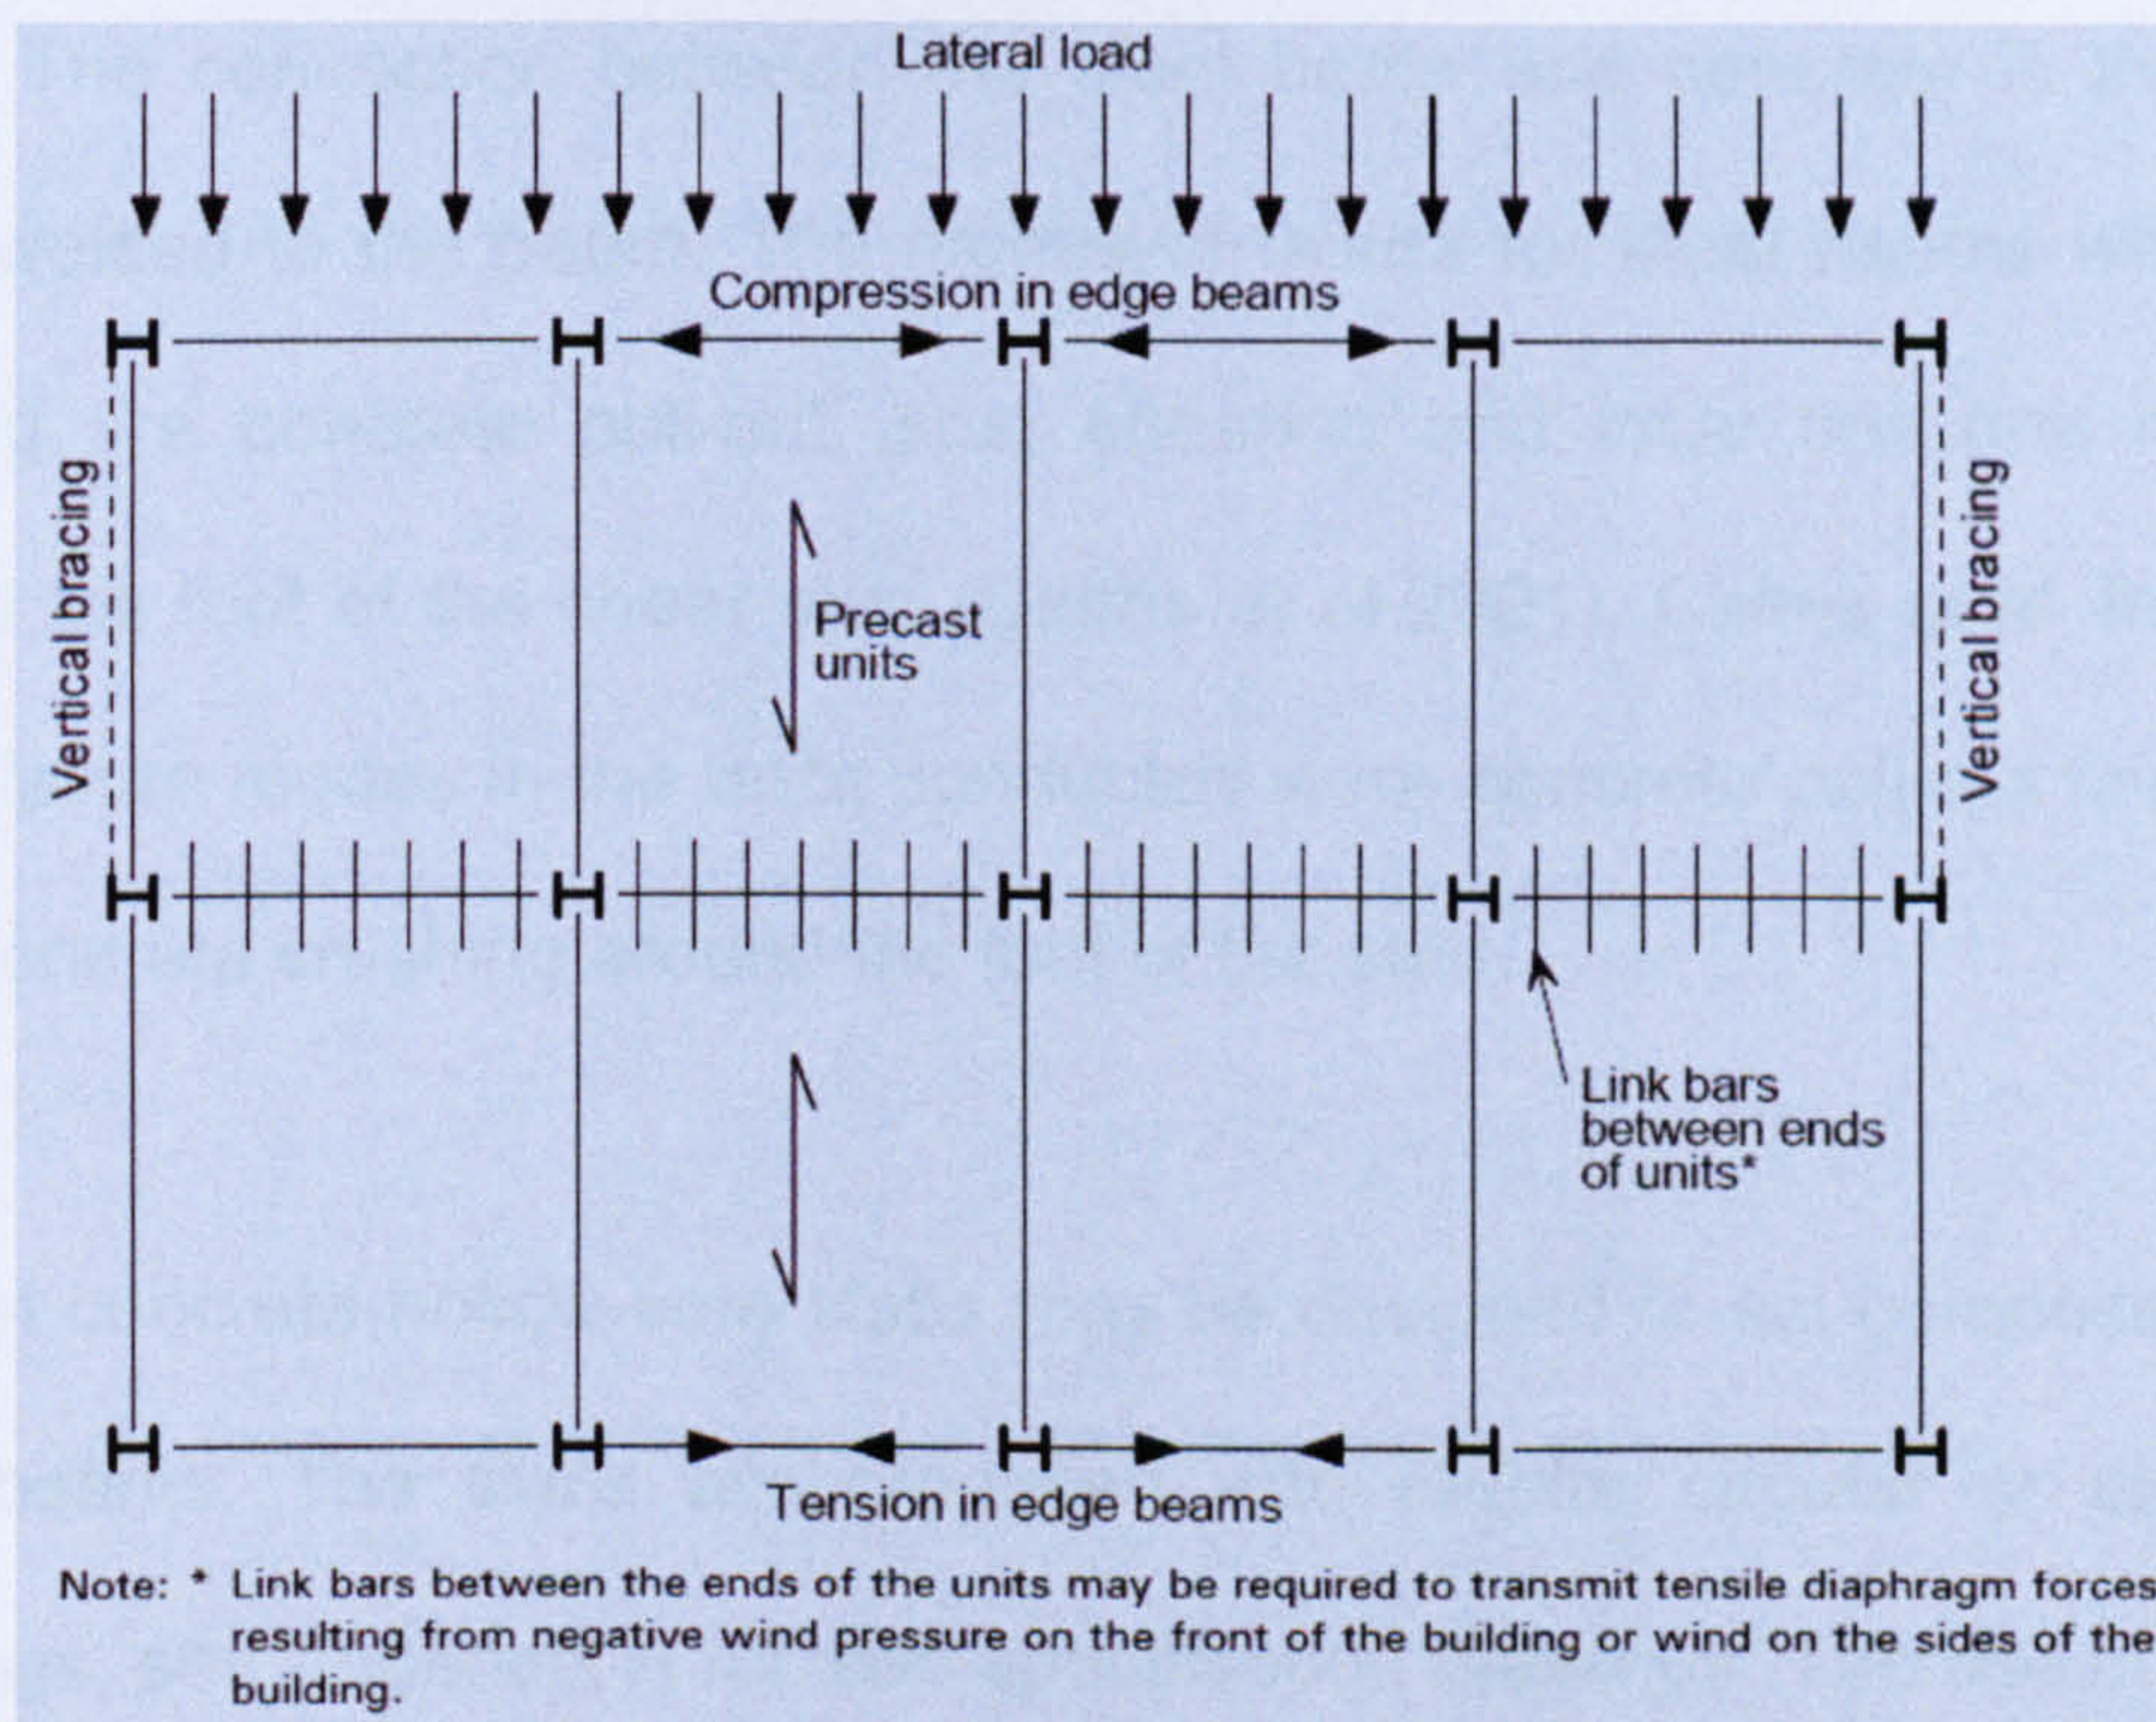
Diaphragm action in a precast slab floor (SCI Publication P351 2007)
